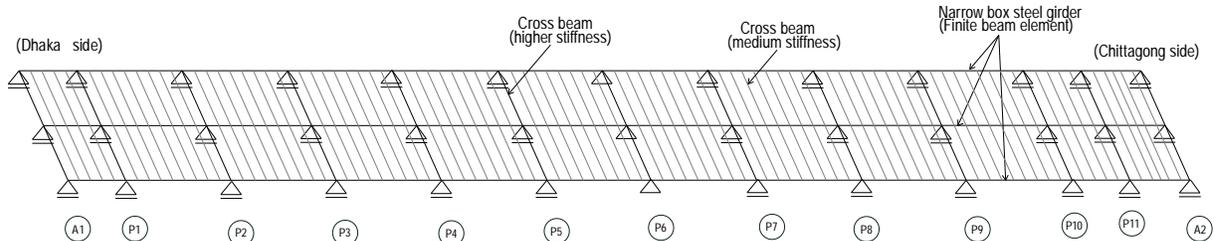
Grid model for girder analysis (2nd Meghna Bridge)
